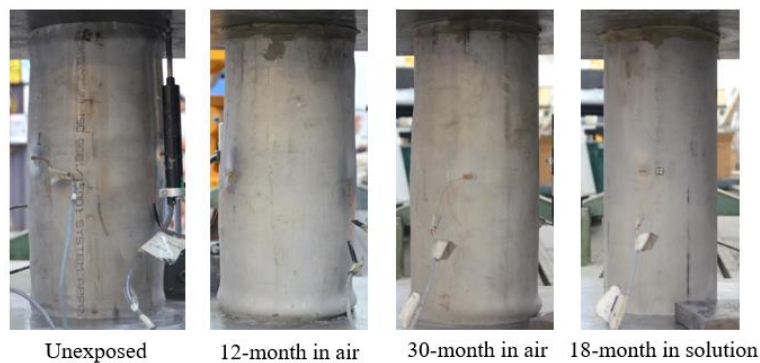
Typical failure modes of SWSSC-filled stainless steel tubes (S165-C)
